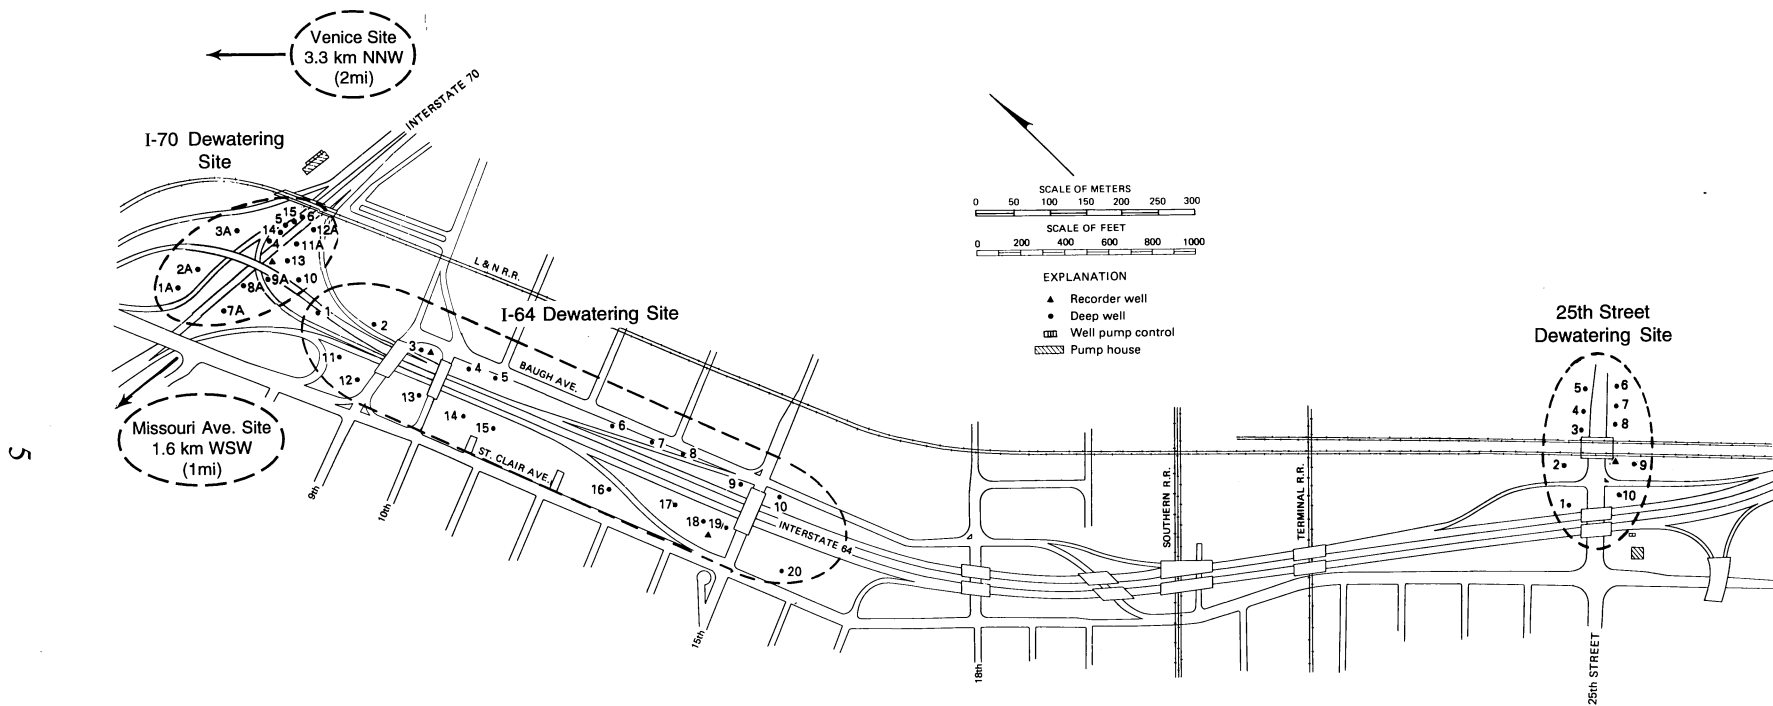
Locations of dewatering wells at the I-70 Tri-Level Bridge, I-64, and 25th Street
